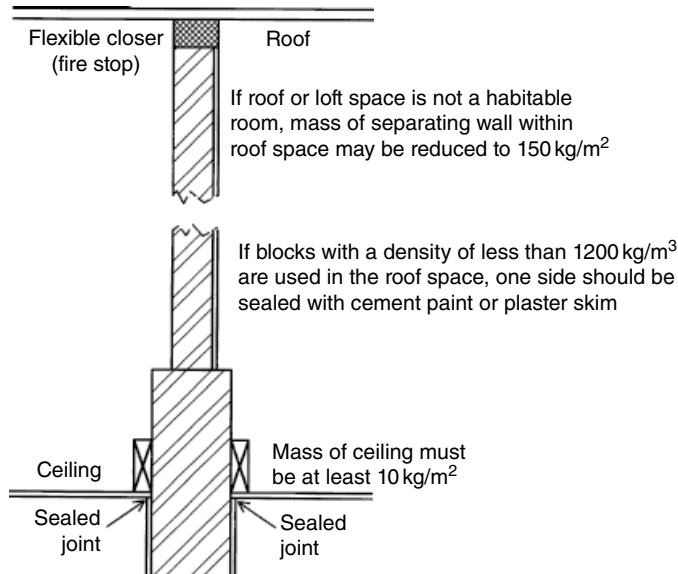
Roof junction using wall Type 1, assuming roof space is not a habitable room.
